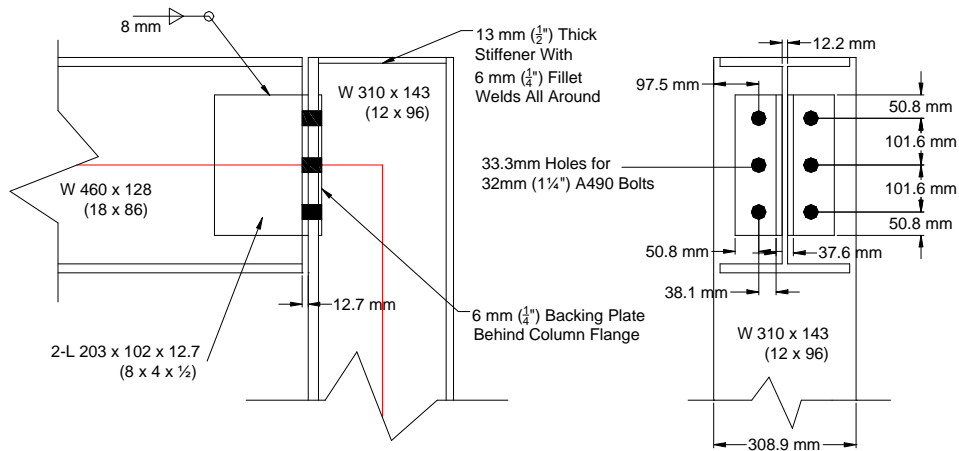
Double Web-Angle Beam-to-Column Connection Detail
